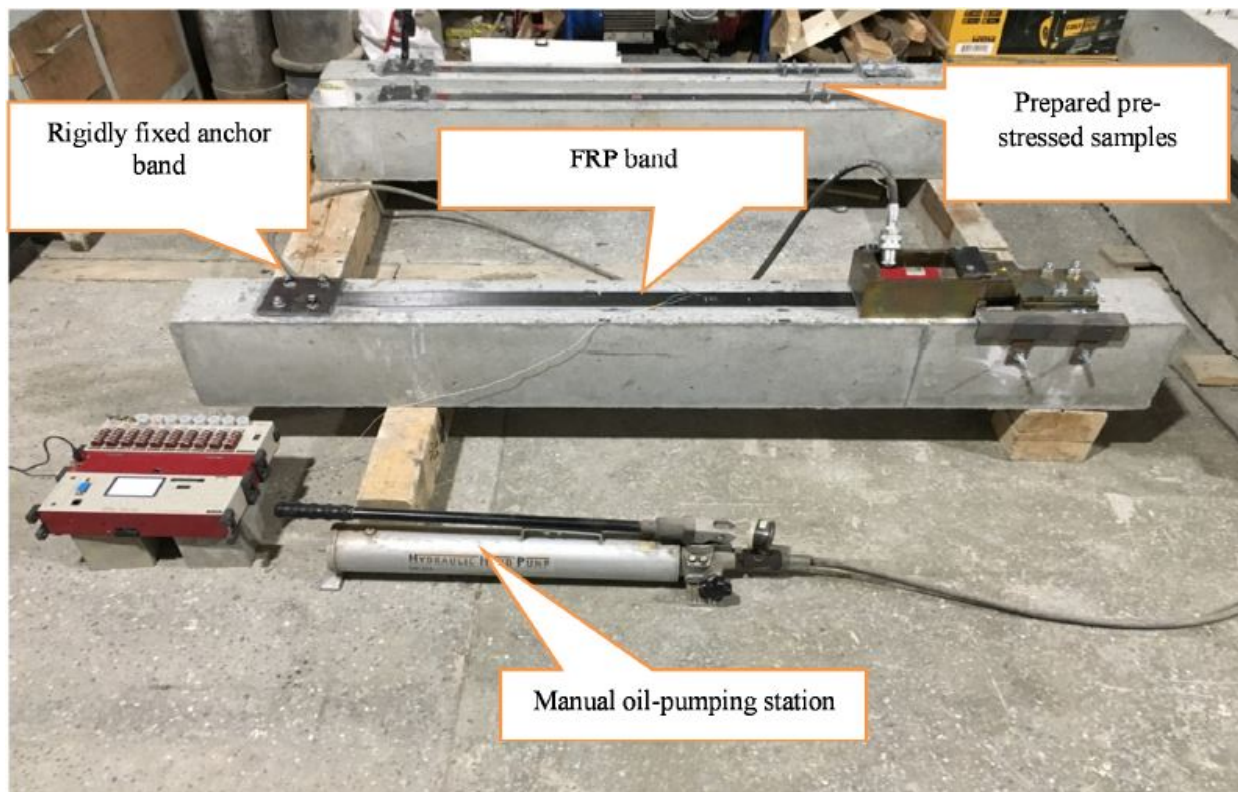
Scheme of work of the TDS-150 to control the loss of prestressing, when reinforcing the FRP of a reinforced concrete beam
